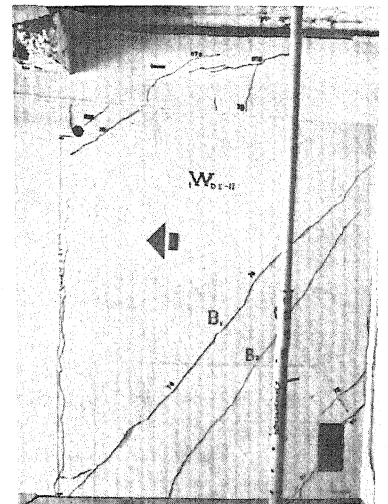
Cracks of the Shear Wall (Hamamatsu Shear Wall Test).
